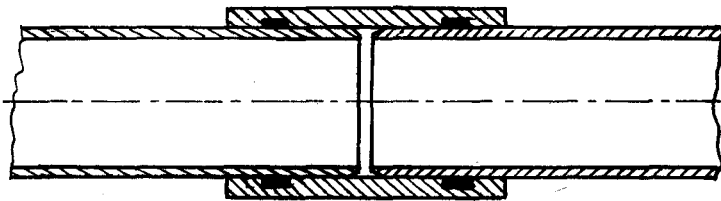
ILLUSTRATION OF DOUBLE SOCKET COUPLING JOINT
